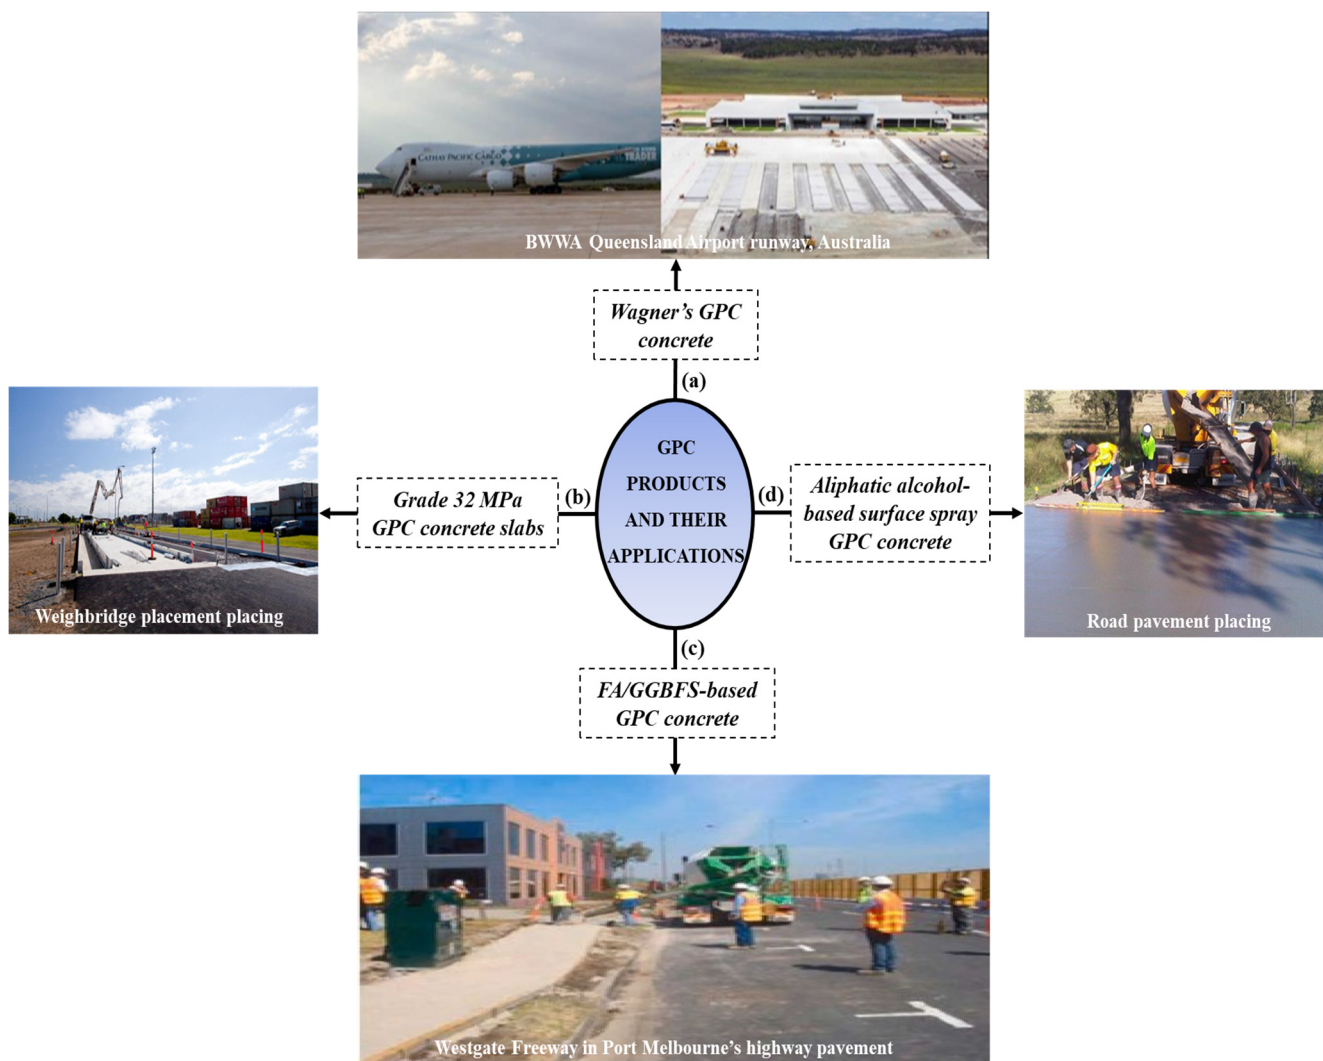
GPC products and their applications: (a) Brisbane West Wellcamp Airport (BWVA) runway, Australia, made from Wagner’s GPC concrete (an Earth Friendly Concrete (EFC)) [1,2], (b) weighbridge GPC concrete slabs at Port of Brisbane [3], (c) FA/GGBFS-based GPC concrete highway pavement [4], and (d) GPC concrete road pavement placing [5].
